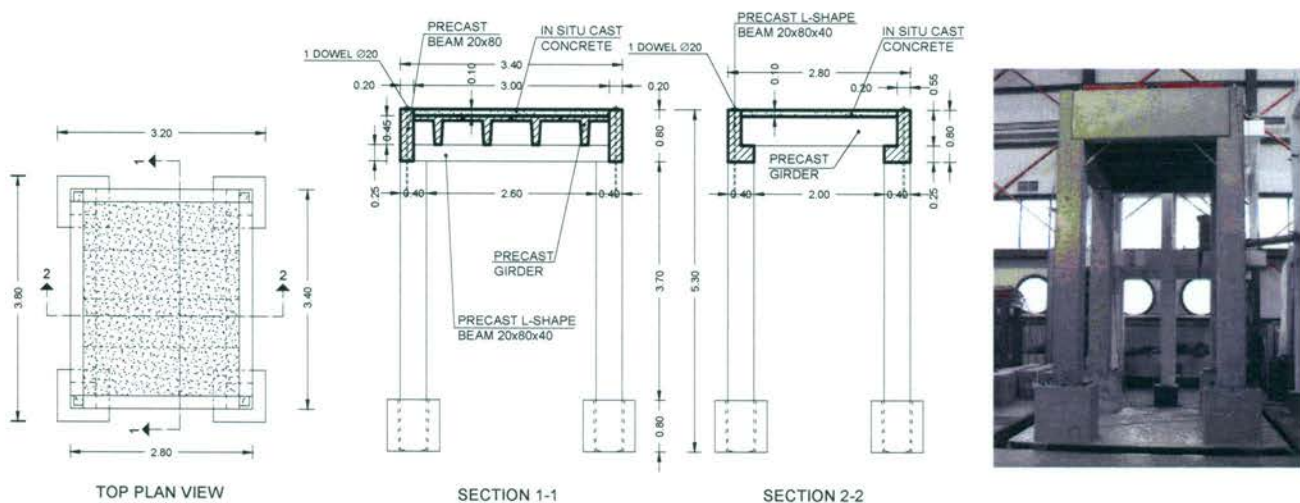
Top view, vertical cross sections and photo of the specimen used in the 1st series of experiments.
